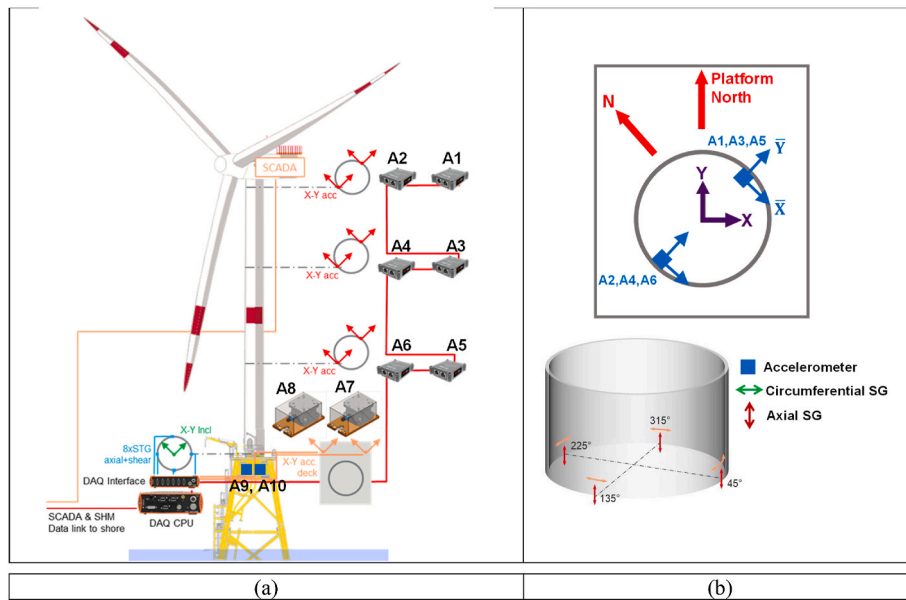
Elevation (a) and top view (b) of instrumentation plan.
